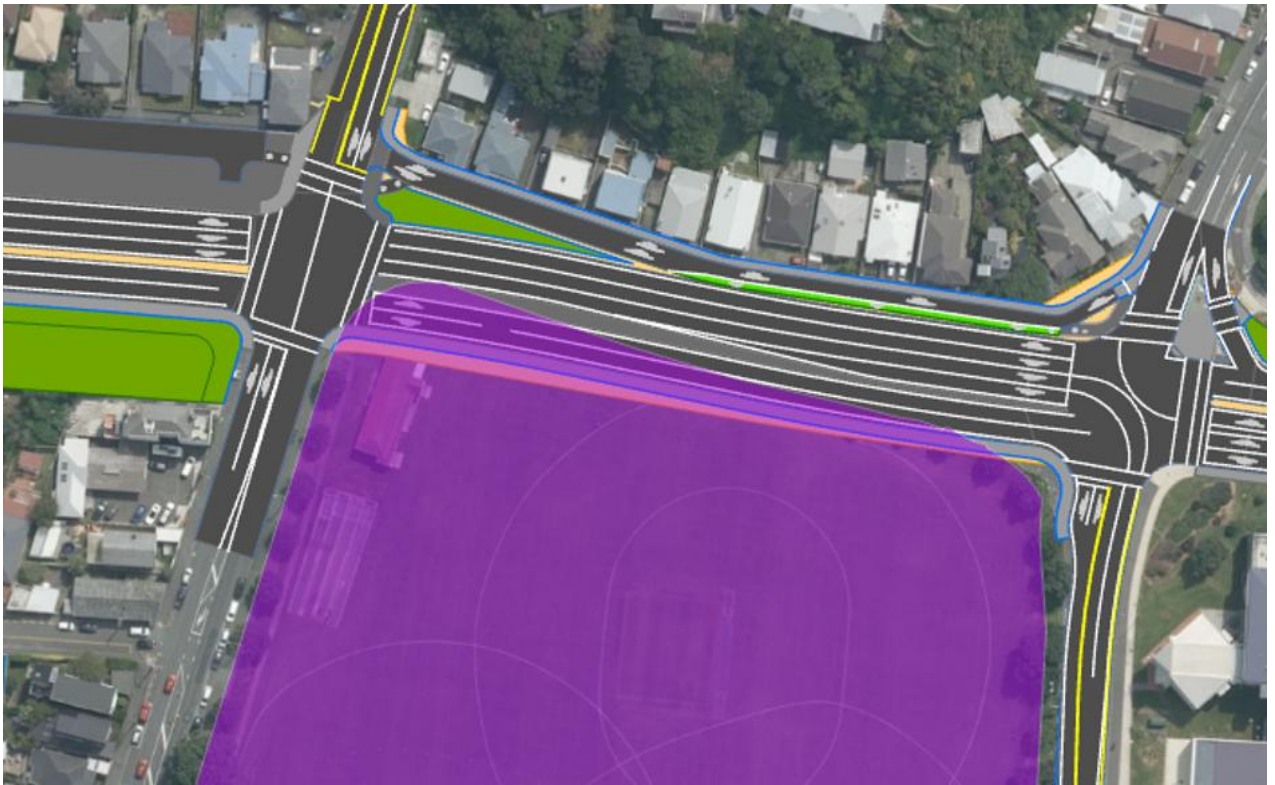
Plan of SH1 improvements at Kilbirnie Park
